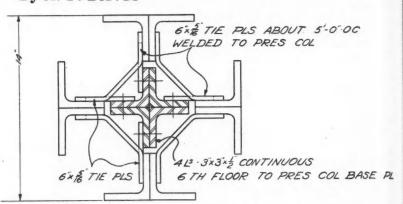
Details of Welded Connections of Tie Plates to Old Columns and New Reinforcements.
